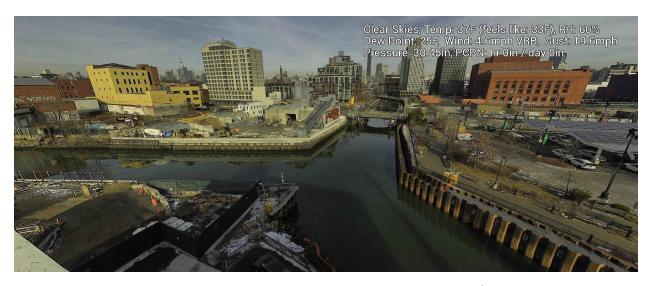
December 27, 2024. General Conditions in Canal north of 9th Street Bridge during work activities work activities.
